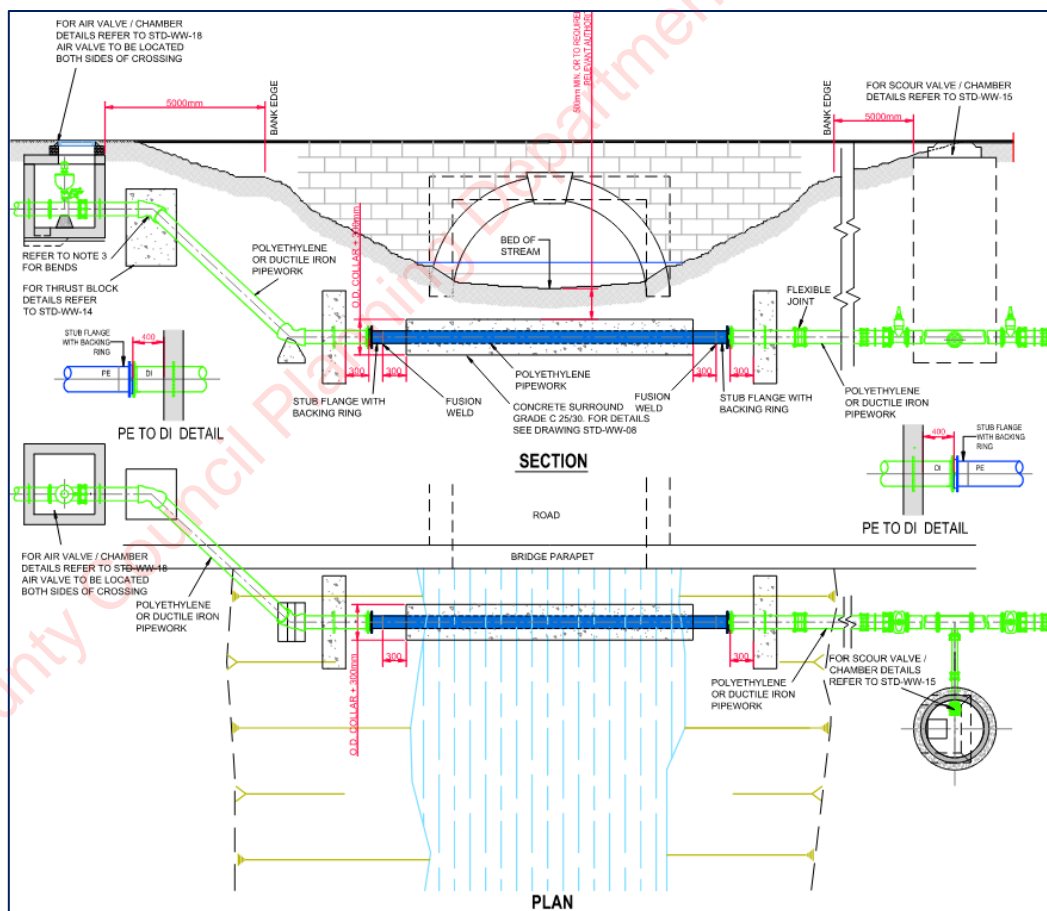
Typical Detail of Rising Main Crossing at Bridge
